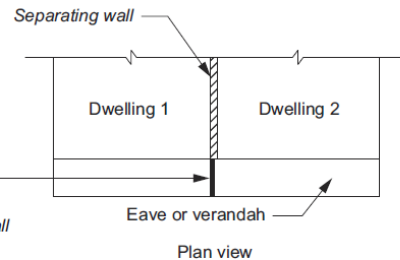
Separating wall construction — Underside of non-combustible roof cladding (diagram 2)
